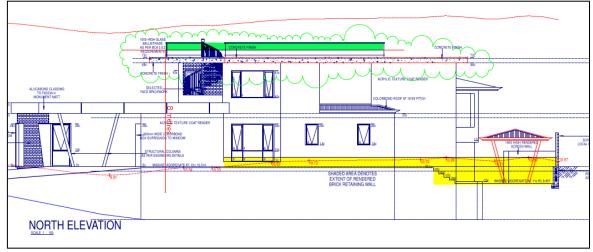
Marked-up Northern elevation showing the proposed maximum building height (highlighted green).
